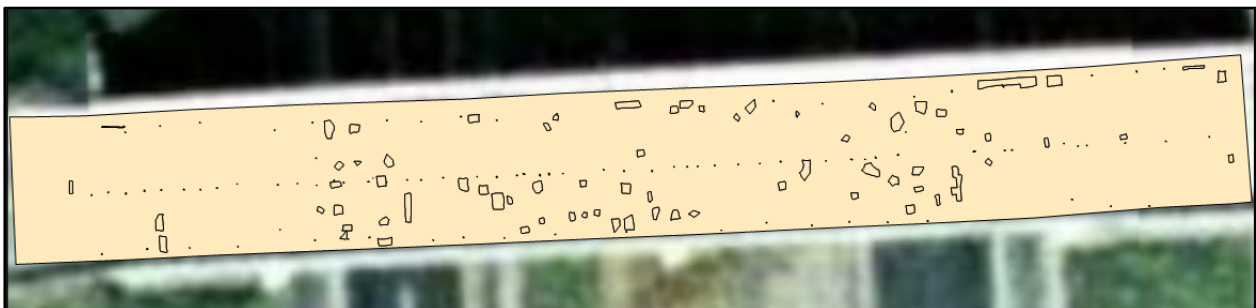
Willow Road bridge MDOT hammer sounding delamination survey.
